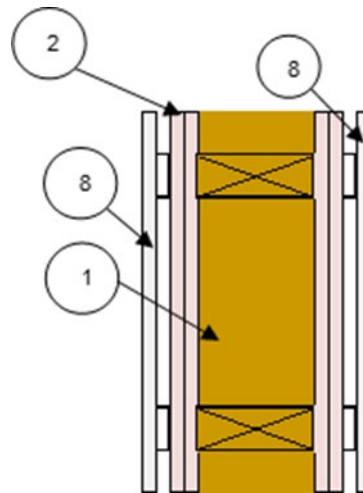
Timber framed single stud wall with non-fire grade linings – Section view
